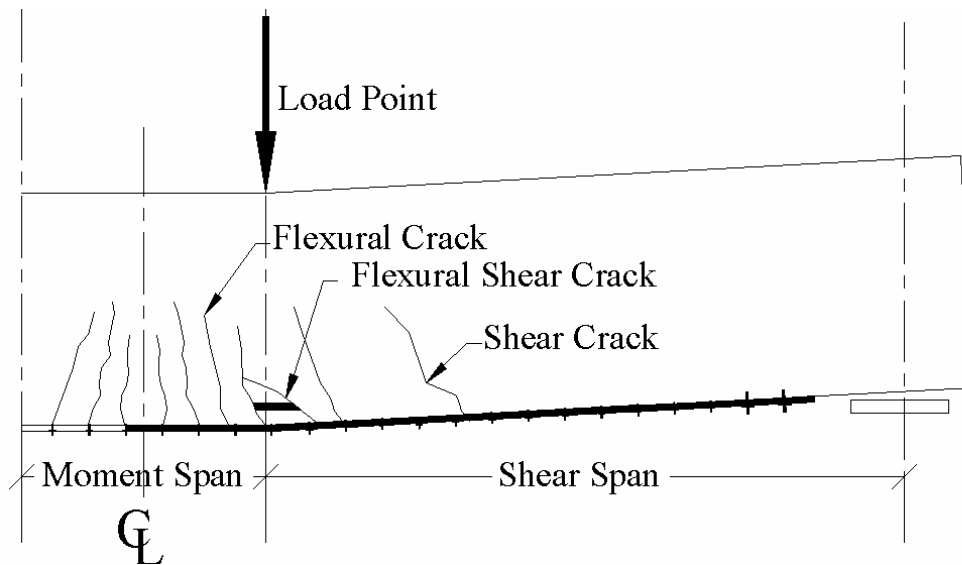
Concrete “tooth” failure due to flexural shear crack under the load point
